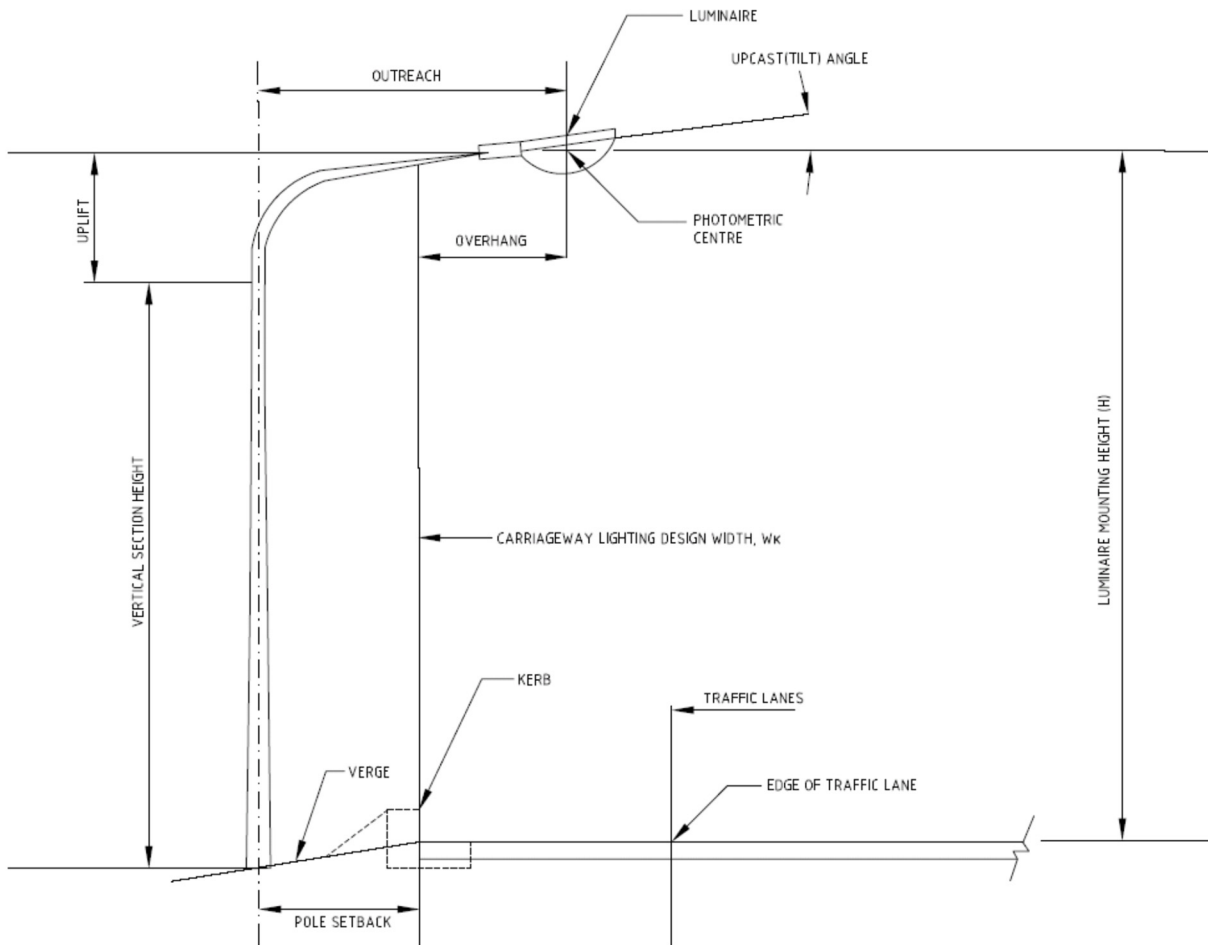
Geometry and Terminology used in a Typical Road Lighting Installation [7]
